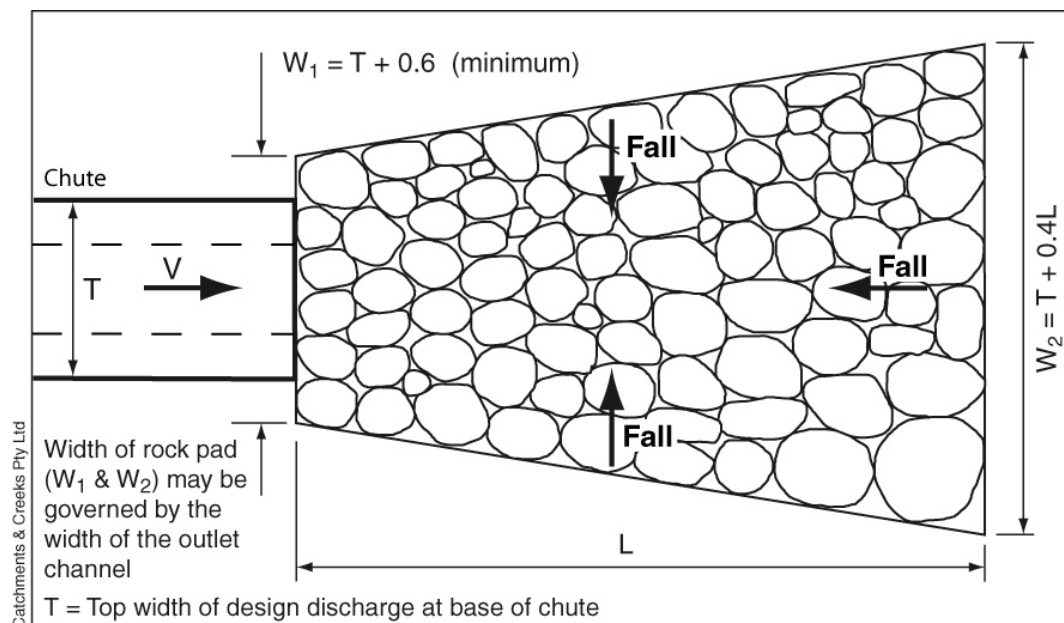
Typical layout of a recessed rock pad for a chute (plan view)
